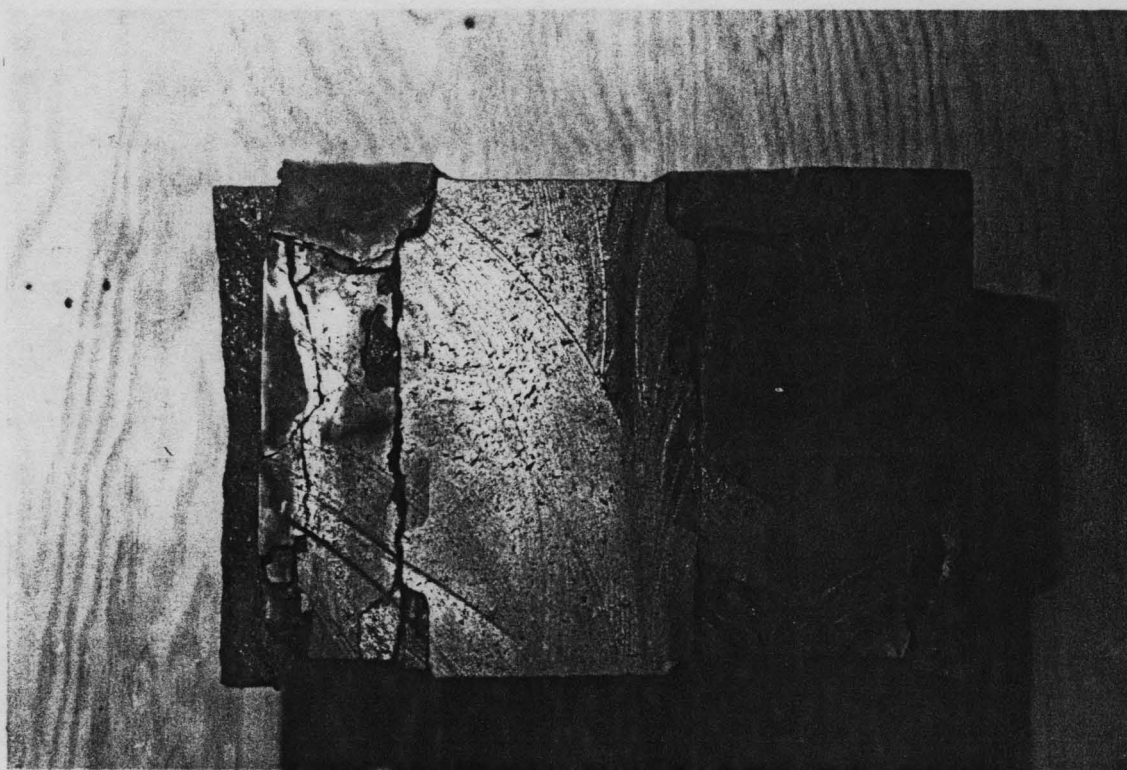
Grooved concrete test pier, CW-CS(0.303), after load testing (cut-section).
